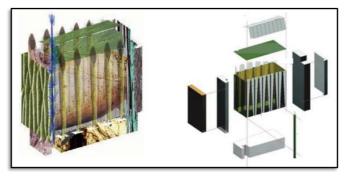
(a) wind pipes on the north façade (b) overlapping layers of the façade
